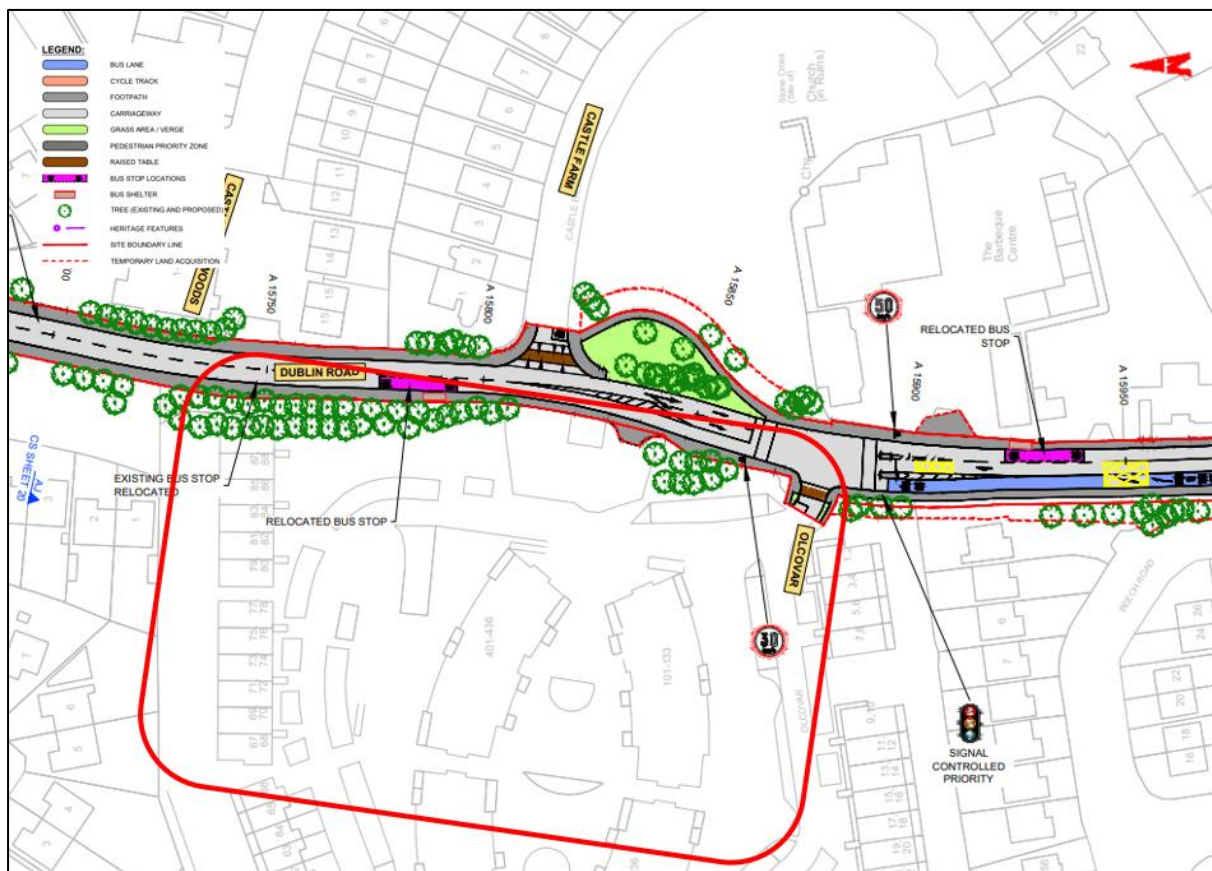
Extract from General Arrangement Drawing at Dublin Road (Sheet 45)
